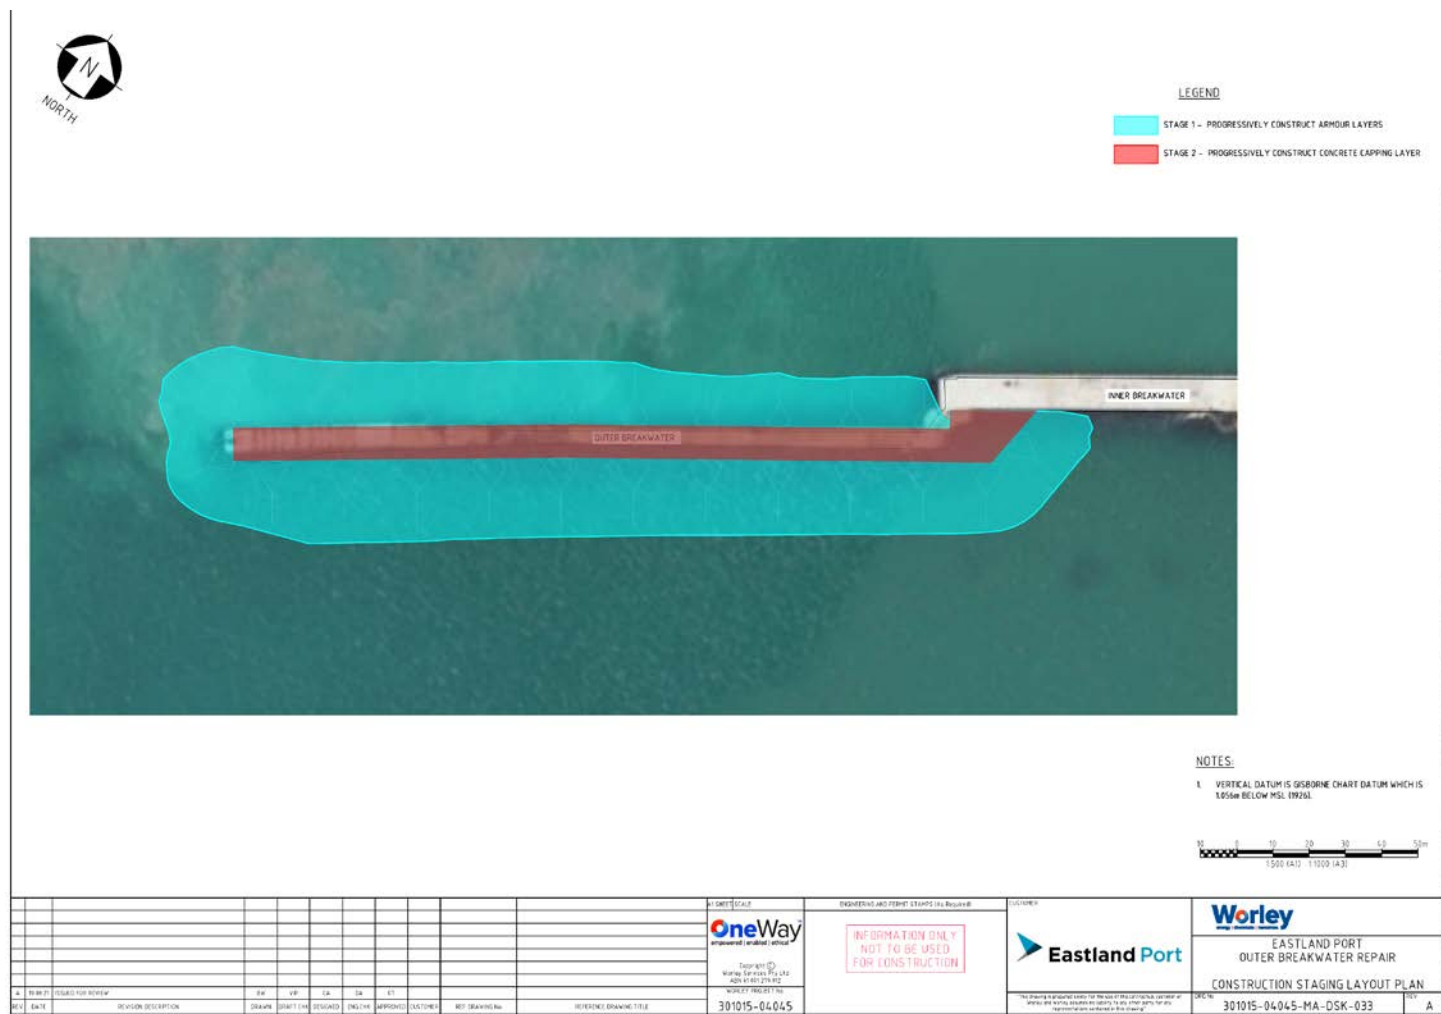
Indicative Construction Sequence – Outer Breakwater refurbishment
